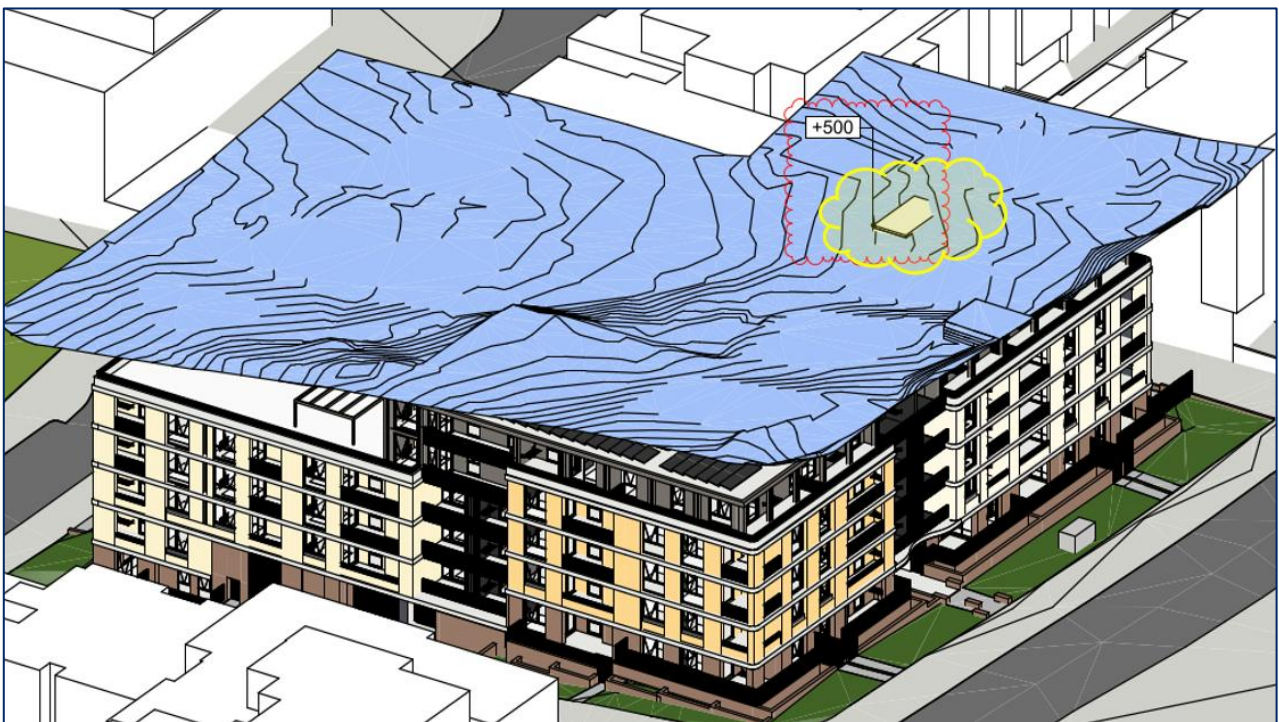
| Height plane diagram showing area which exceed the building height (base source: Applicant's modification report)
